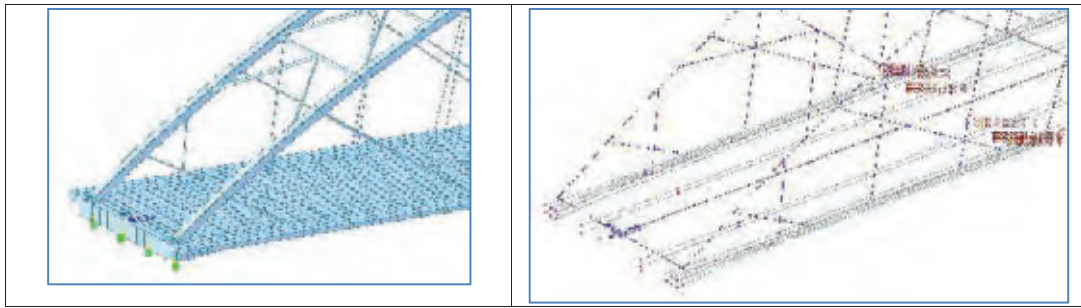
3D plate elements model and beam element with prestressing tendons.
